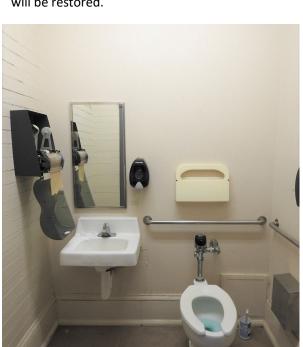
Existing non-ADA compliant  $\mathbf{1}^{\text{st}}$  floor restroom.
